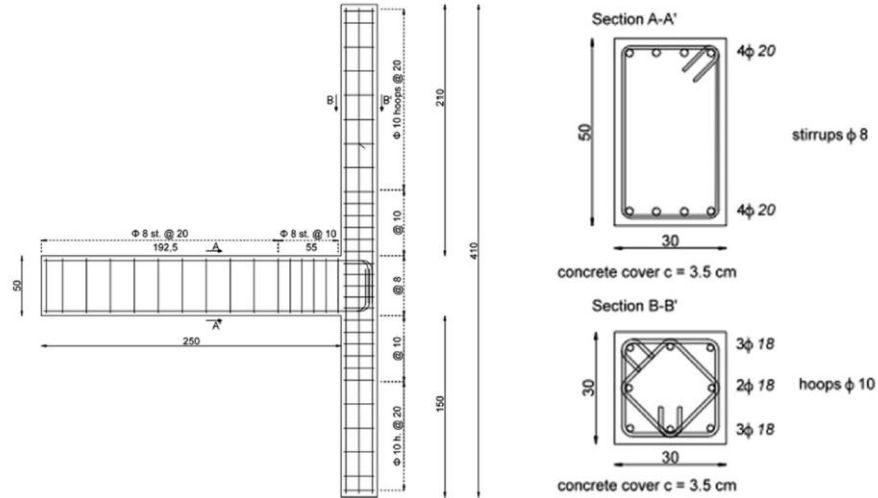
Dimensions and reinforcement details of the test specimens. (Faleschini et al. 2019)
